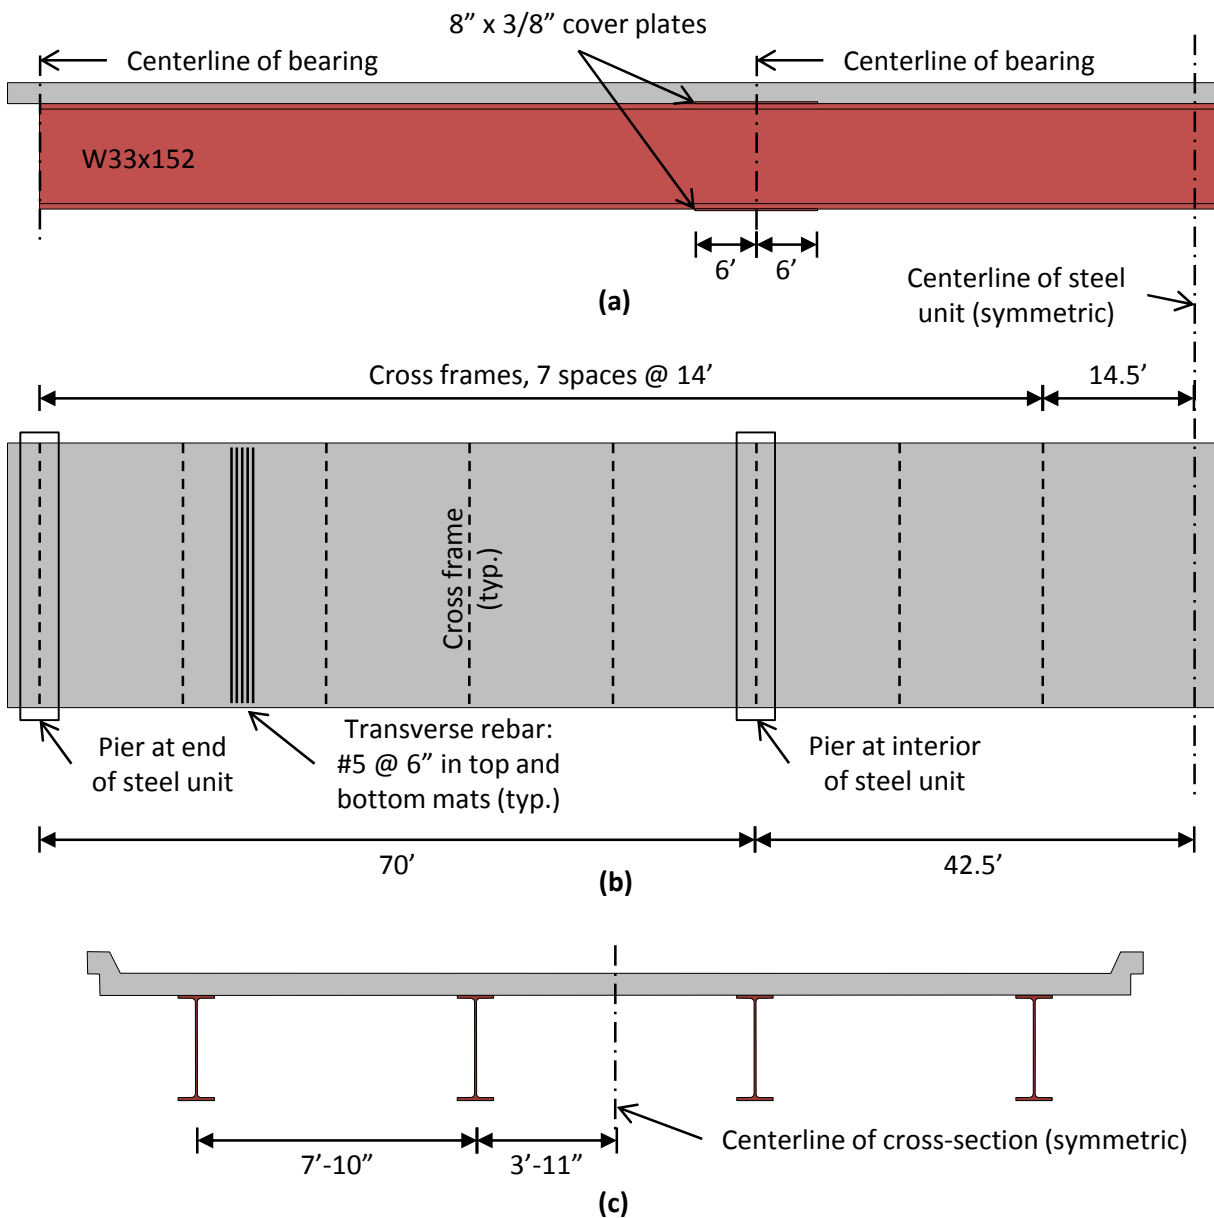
Geometry of Sample Bridge – (a) Elevation, (b) Plan, and (b) Cross-section views
